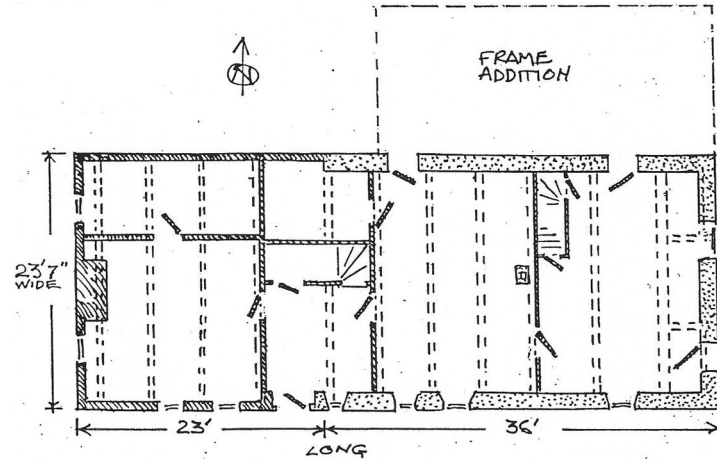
Floor plan drawn by Peter Sinclair. From HVVA Newsletter, Vol.4 No.5 (June 2002), 5.
